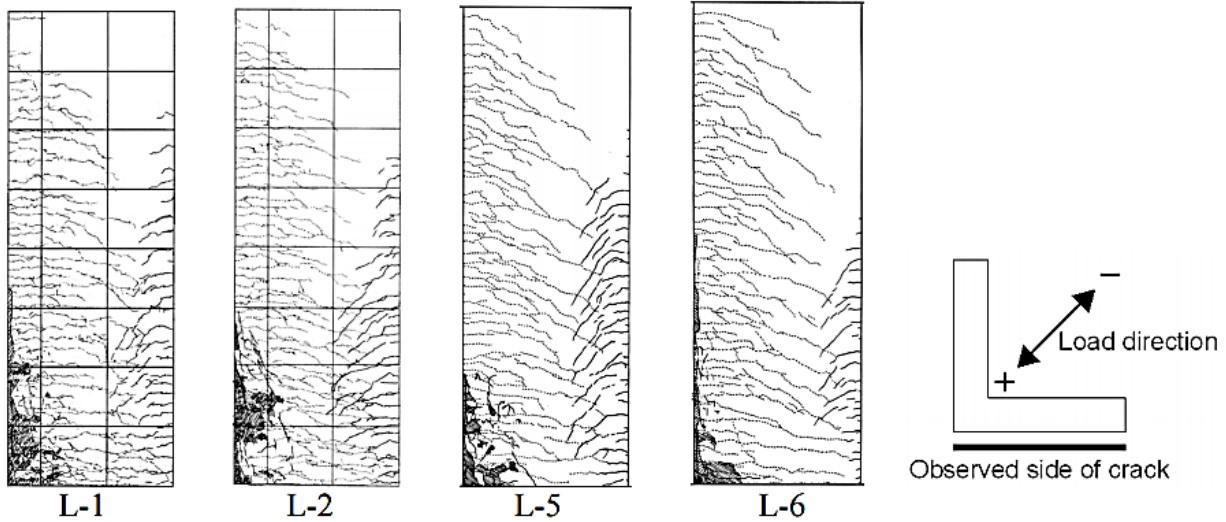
Damage to the specimen at end of test Hosaka [92]
